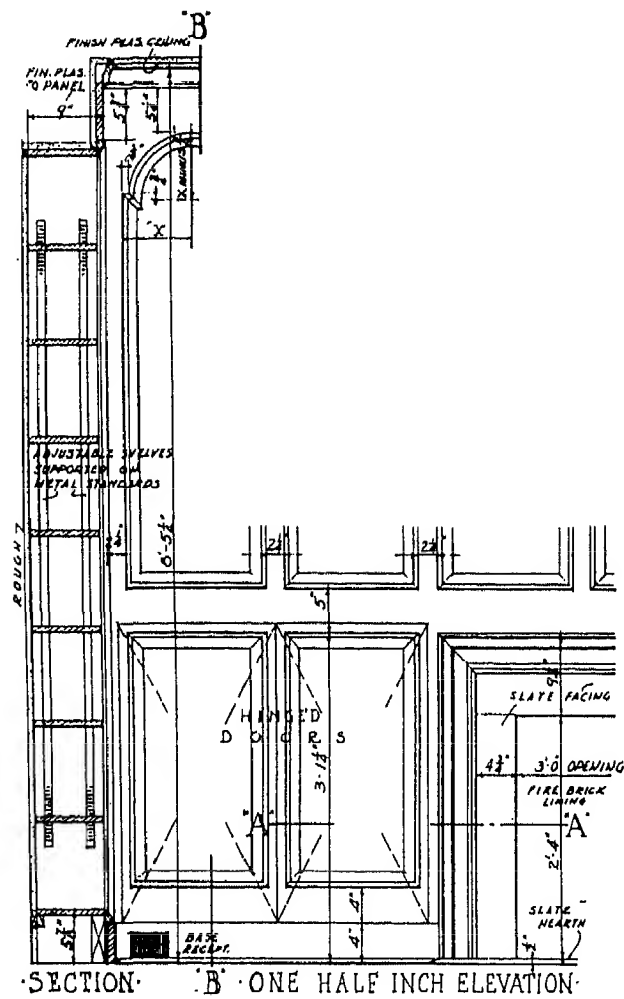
DETAIL OF WOOD WALL & CORNICE - LIBRARY
